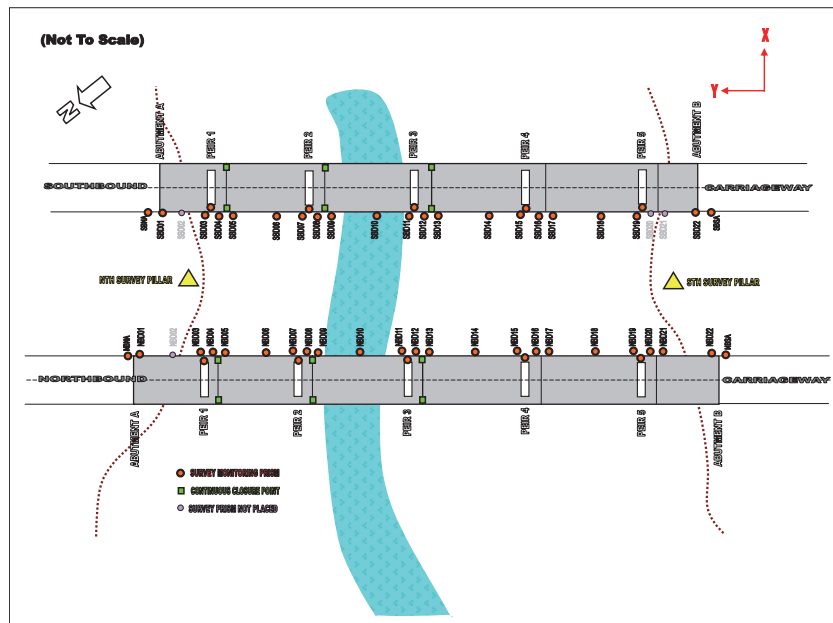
Plan of the relative 3D monitoring points on the Douglas Park Twin Bridges (Source: IMC)
